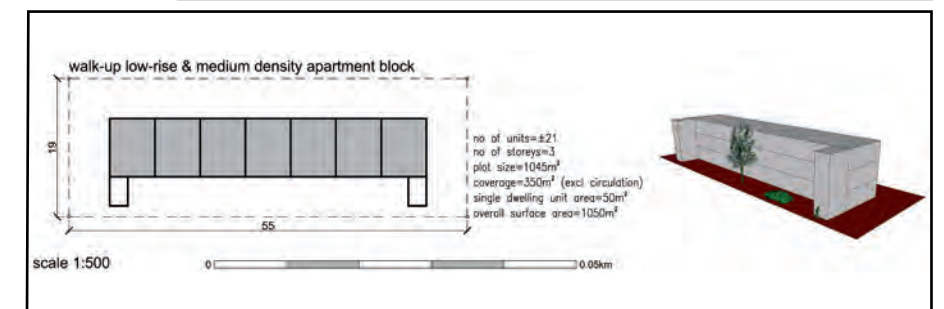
Walk-up apartment block type G (Source: down to erf)
